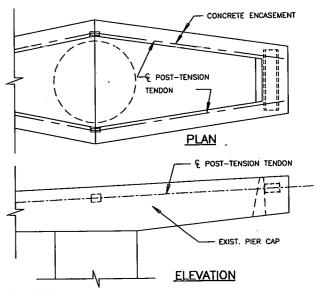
Pier cap strengthening by post-tensioning (Connecticut DOT).
